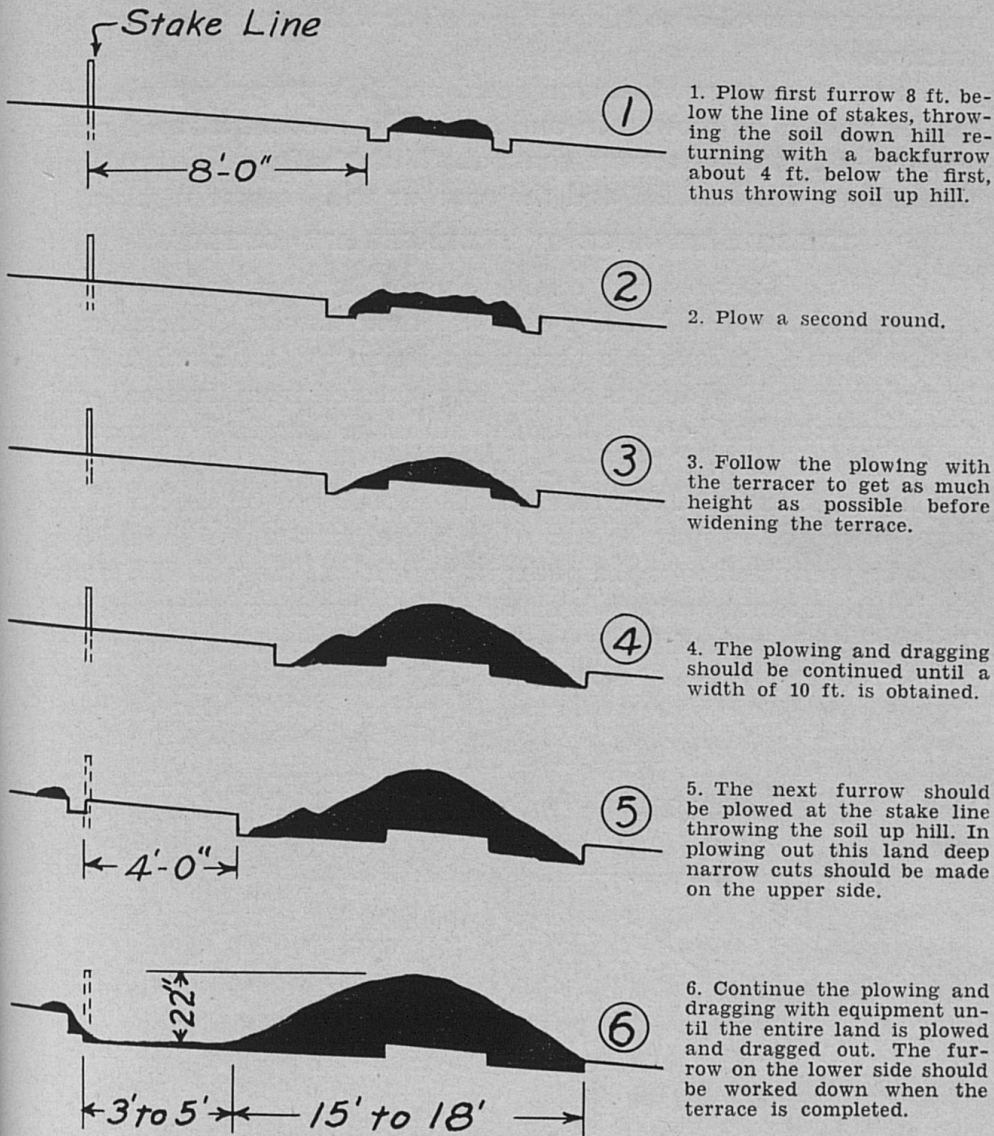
Constructing the broad-base terrace with horse-drawn or farm-tractor-drawn equipment.
